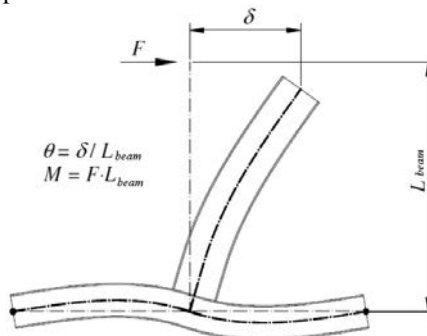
Parameters for beam to column joints tested applying the force at the tip of the beam.
